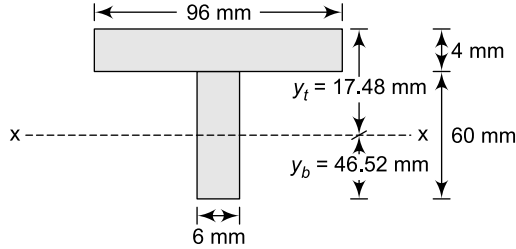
Cross Sectional Dimension of Vertical Stiffeners (Not to Scale).
